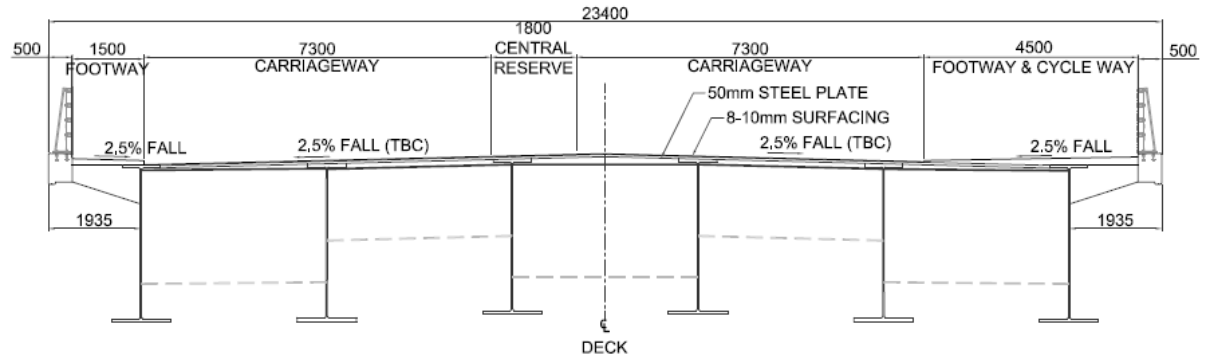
I beam girder arrangement deck (adapted Mouchel/WSP report)
